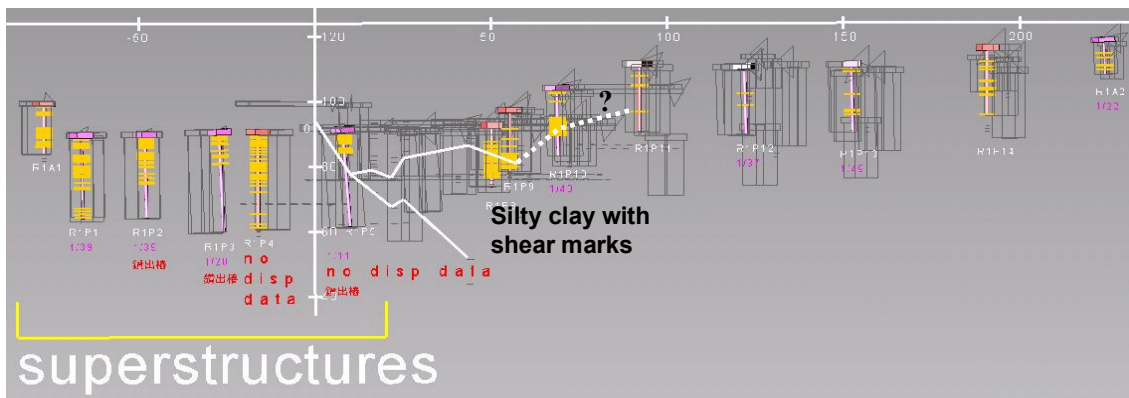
Location of cracks in cores from piles for the Ramp #1 viaduct piers and abutments looking from south to north in the direction of along the estimated fault trace: This figure is prepared from the 3D model of Bauweishan, displaying Layers “2D-ramp1 Post EQ”, “captions-ramp1”, “cracks-ramp1”, “scale” and hiding the others. It is remarkable that piles near the estimated fault, regardless of their locations on either hanging wall side or foot wall side, were severely cracked. However those on the hanging wall side appeared rather deeper locations and seemingly close to boundary between the surface stratum and the silt-clay wedge with shear marks. The farther the piles were on the hanging wall side, the sparser the cracks were. Note those on the hanging wall side sustained no pier when the earthquake occurred.
